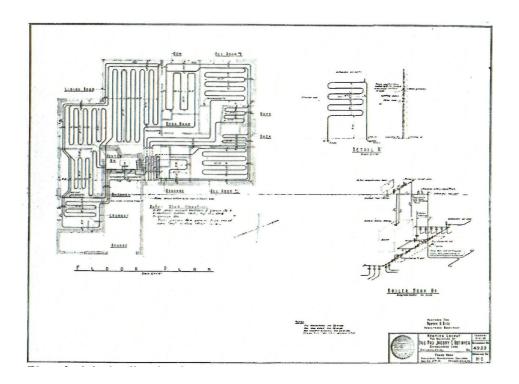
Original underfloor hydronic radiant heat system plans.⁴⁰
